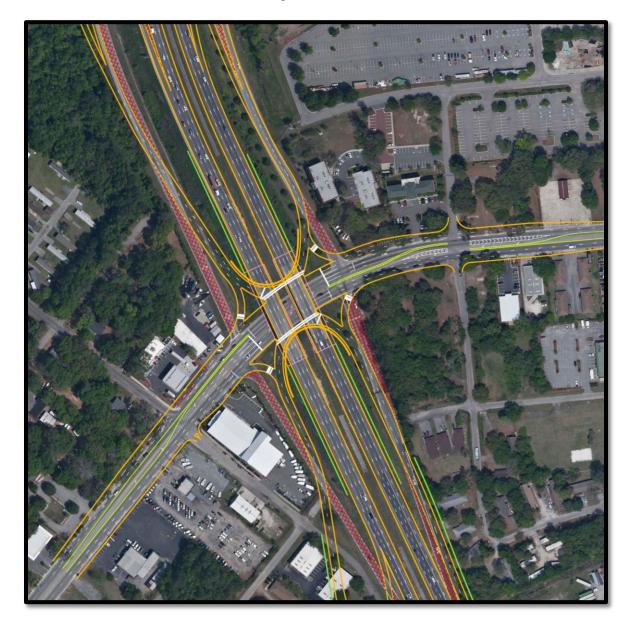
Montague Avenue Alternate 3B – DDI (Airport Connector Road Alignment)
